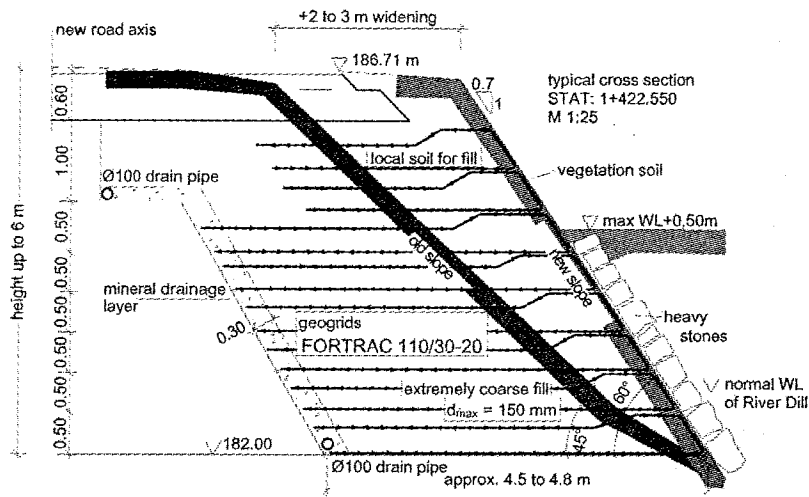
“Federal Road B 227” – Typical cross-section differing inclinations and slope shapes
